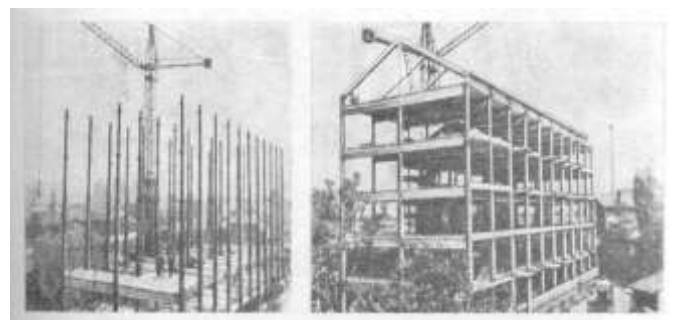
A skeleton building with one – piece precast spun concrete columns, views of the building in various stages of erection
